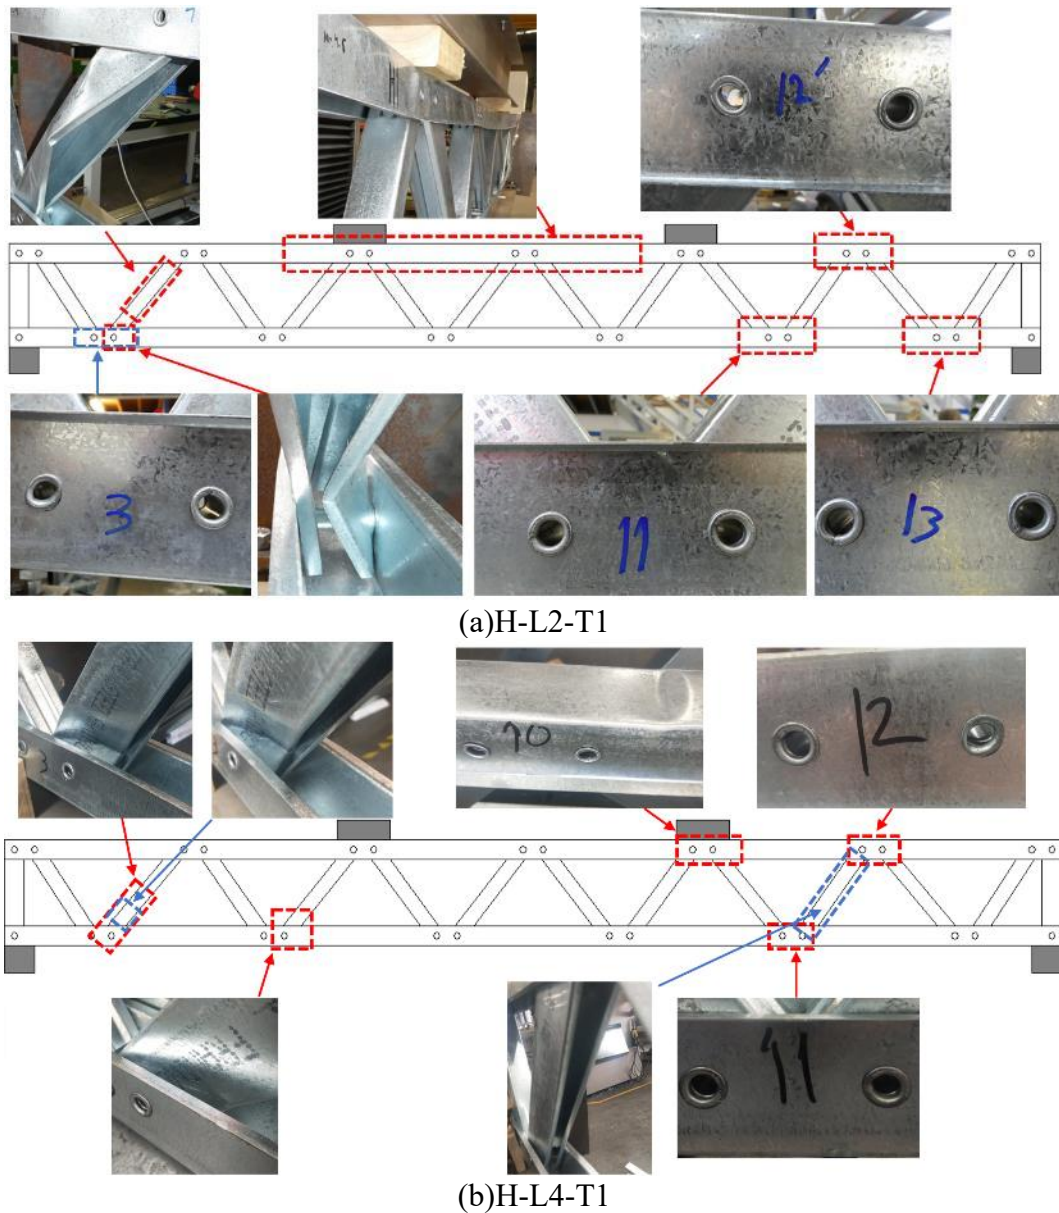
Deformed shapes of CFS trusses with hat sections as chords
